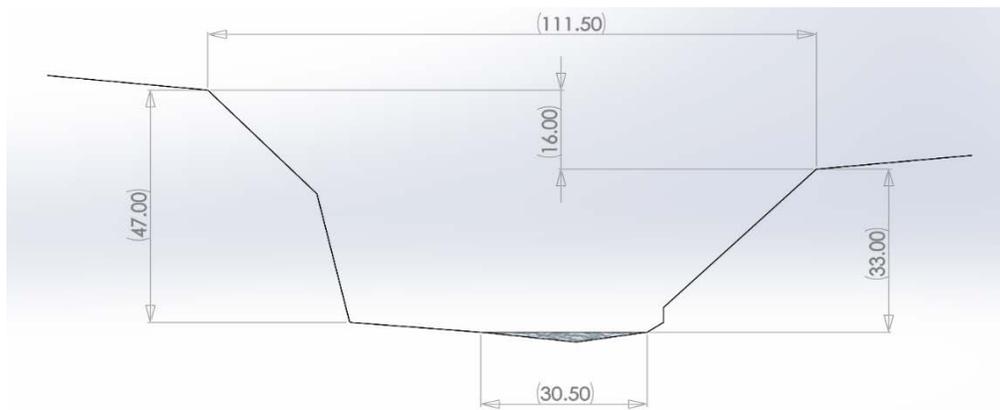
Wadsworth Site Cross Section (Dimensions in ft.)
